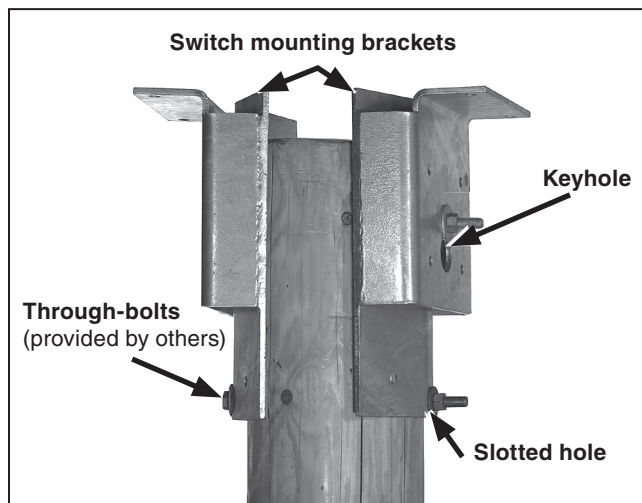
Positioning the switch mounting brackets (pole-top mounting configuration shown).
